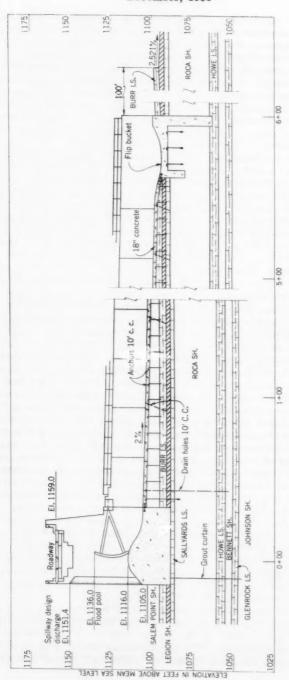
SECTION-SPILLWAY STRUCTURE
